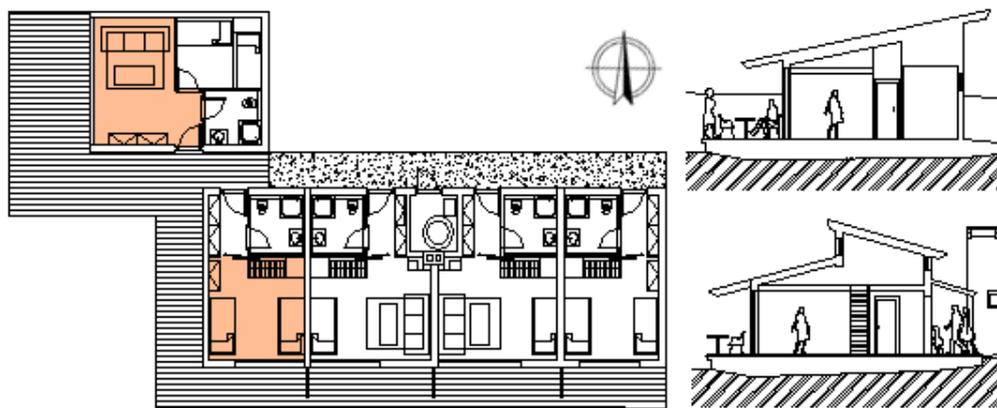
Accommodation buildings, plan and sections, the rooms assessed on the aspects of summer overheating is marked
